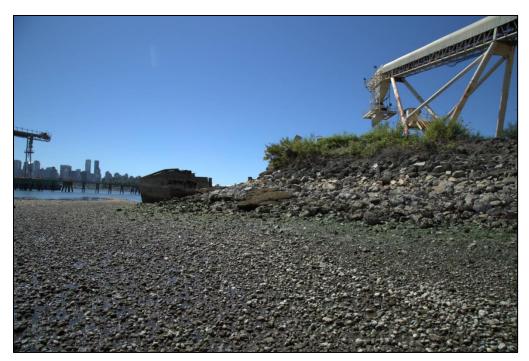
Rip-rap and foreshore looking west at Project Site rail jetty modification area, southeast side
